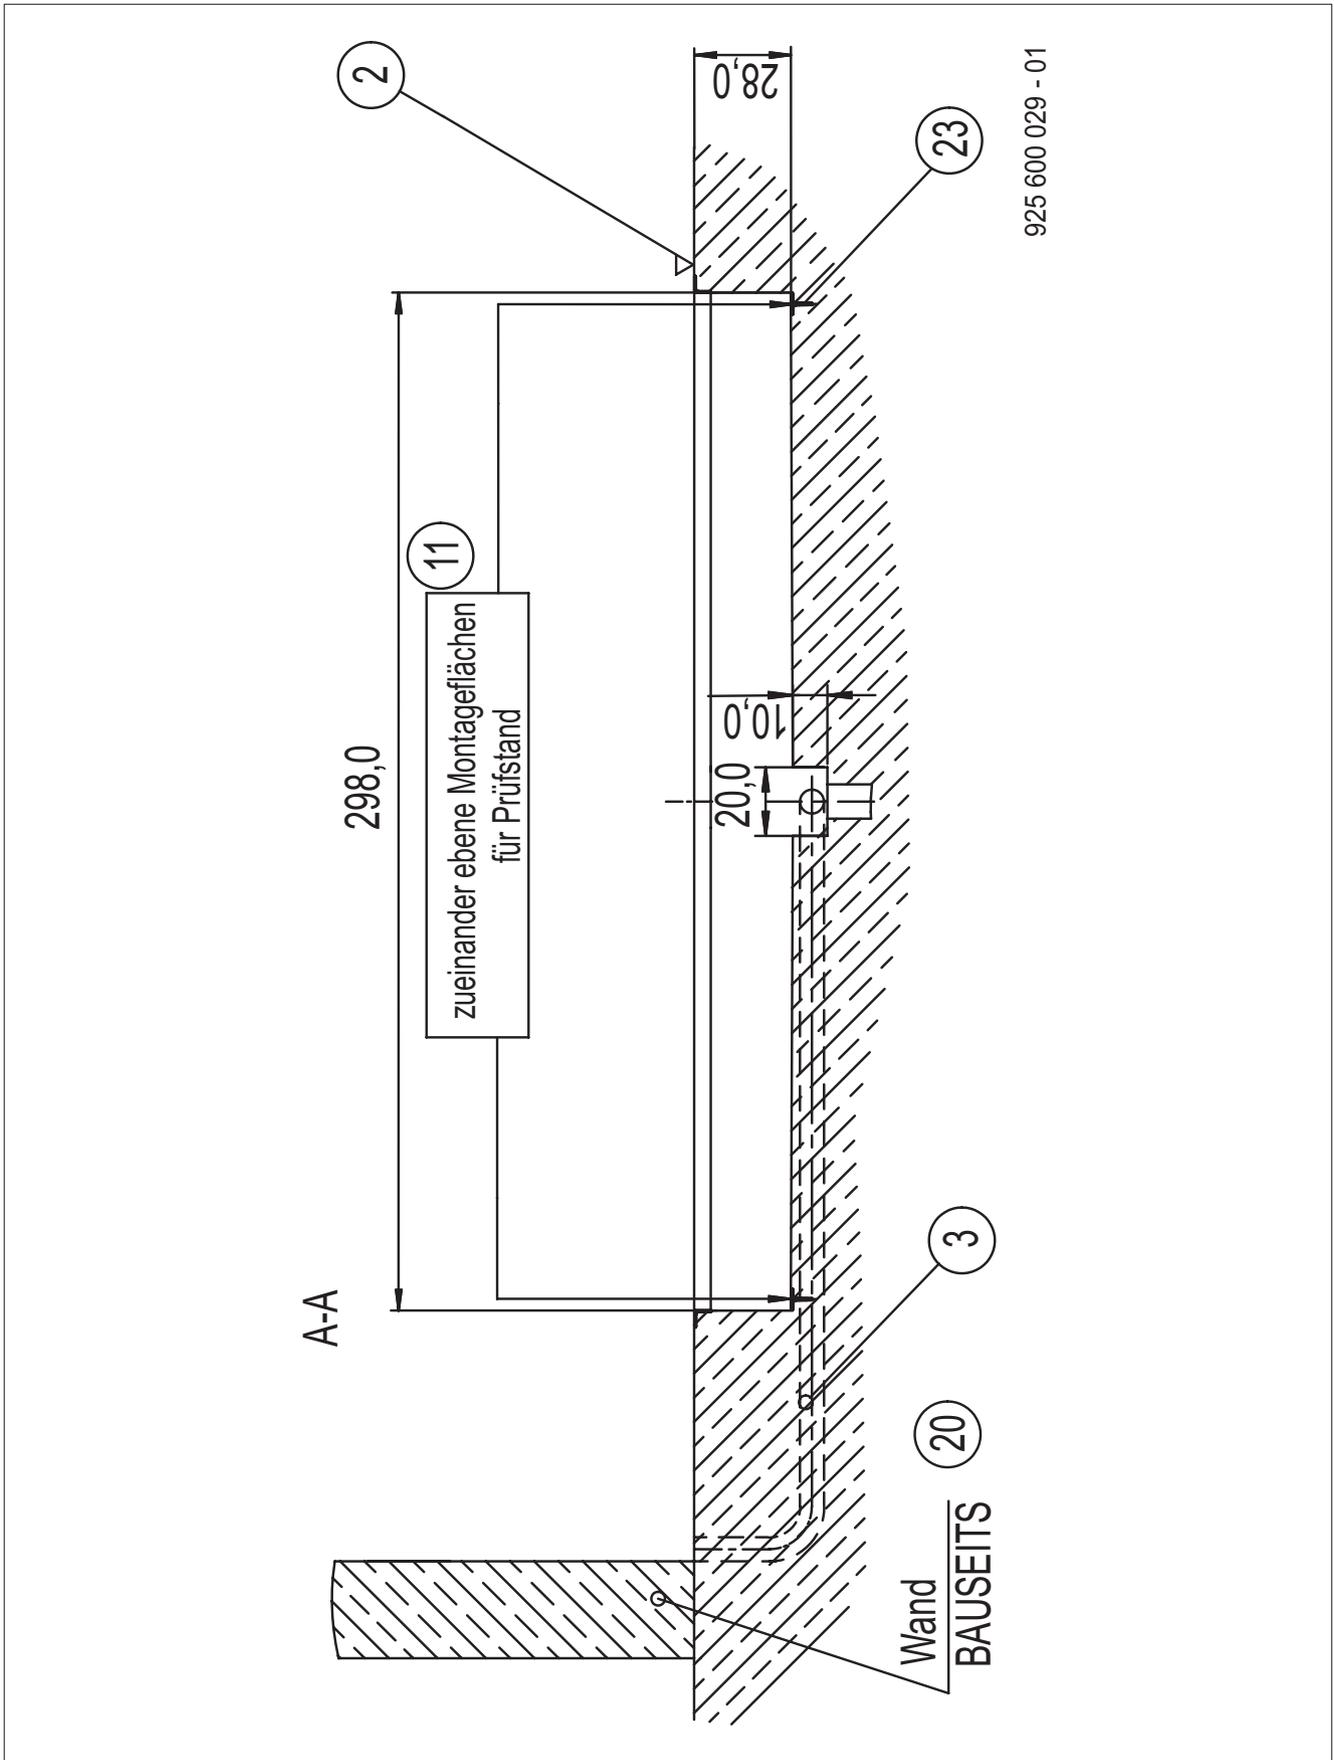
Plan of Pit BD 660 with wall bracket - Sectional view A-A
